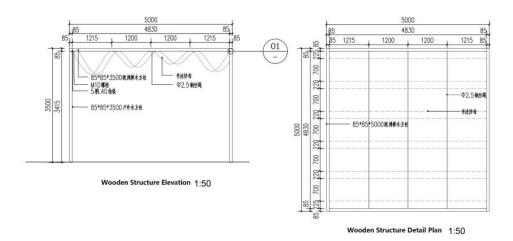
Structural construction drawings of "Books are unfolded like blossoming flowers" work
